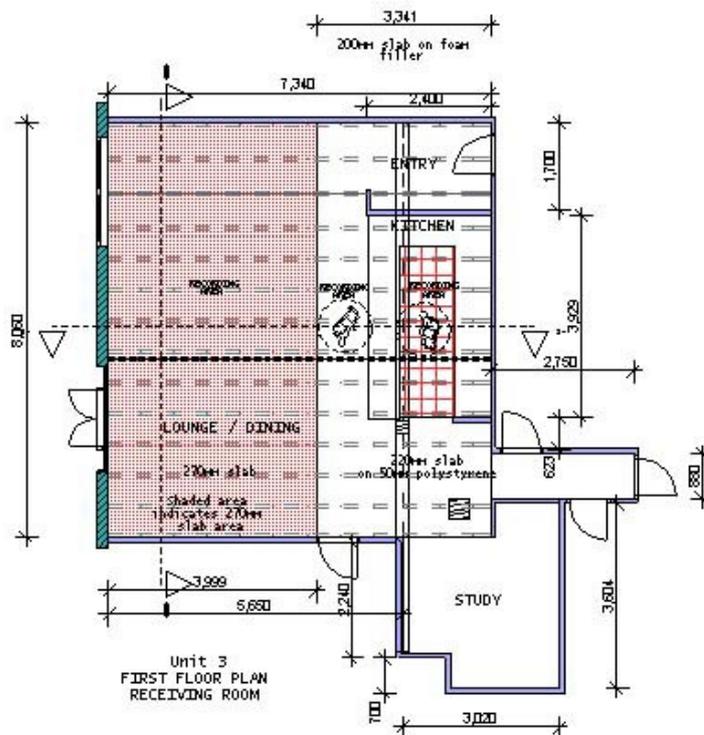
FLOOR PLAN - RECEIVING ROOM
